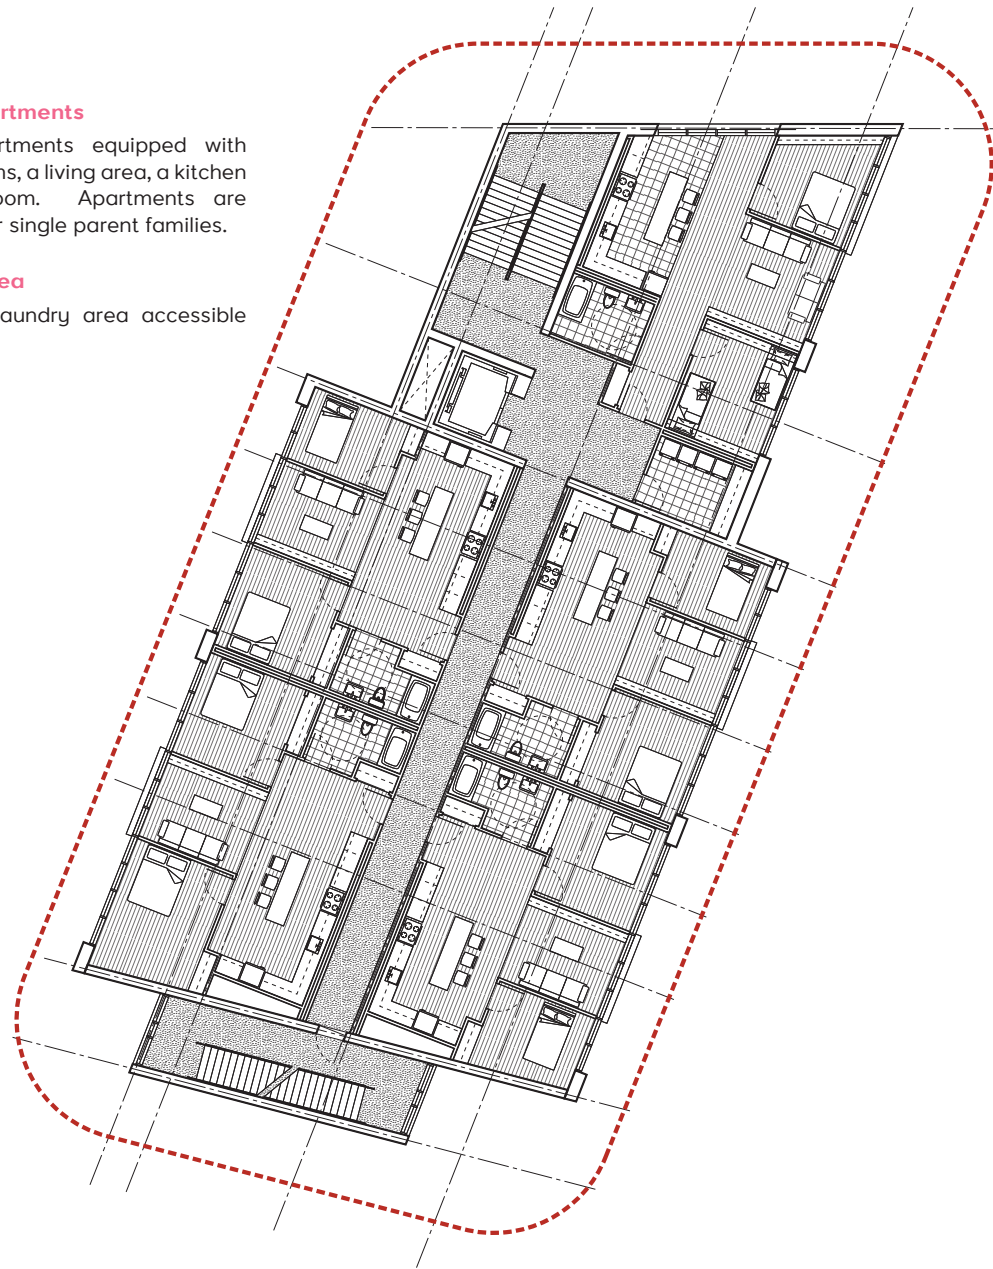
Family Housing, 2nd Floor Plan (3rd Floor Similar).
